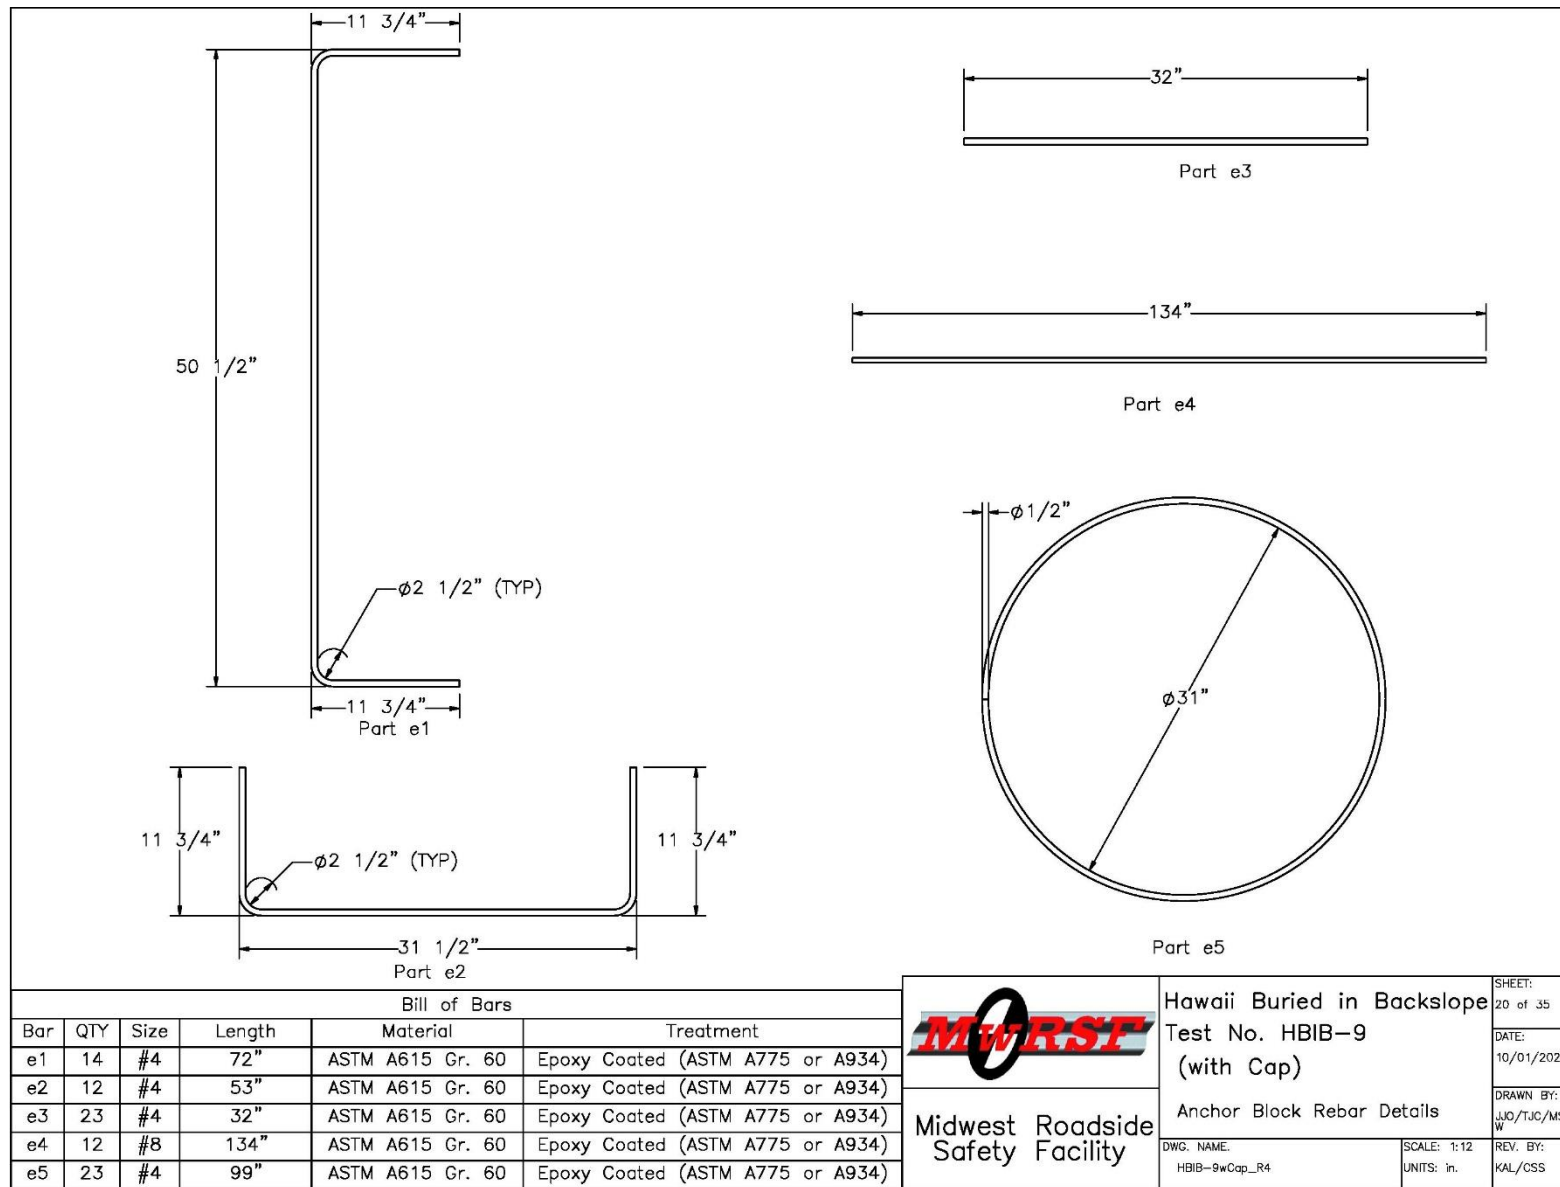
Anchor Block Rebar Details, Test No. HBIB-9
